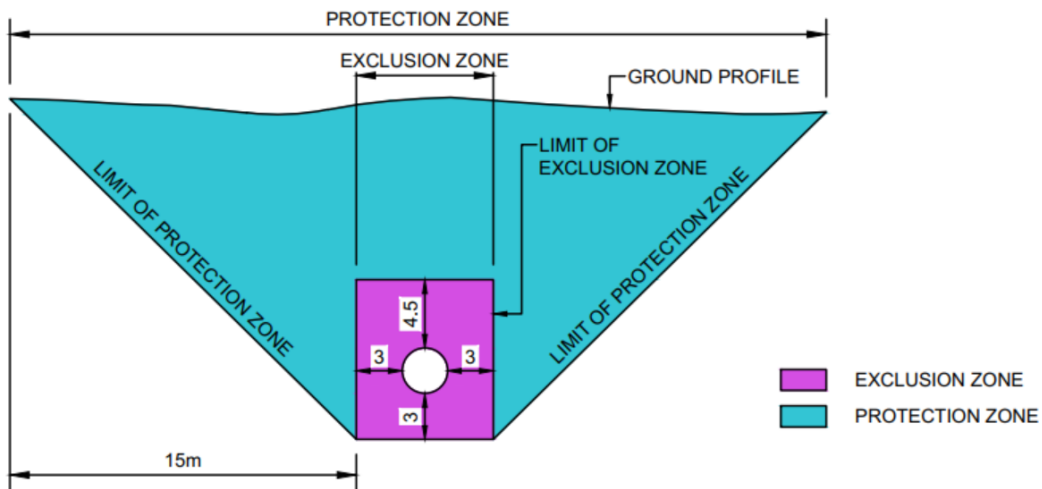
Exclusion and Protection Zones for Belfast Stormwater Tunnel 1.5 m to 2.44 m Tunnel
